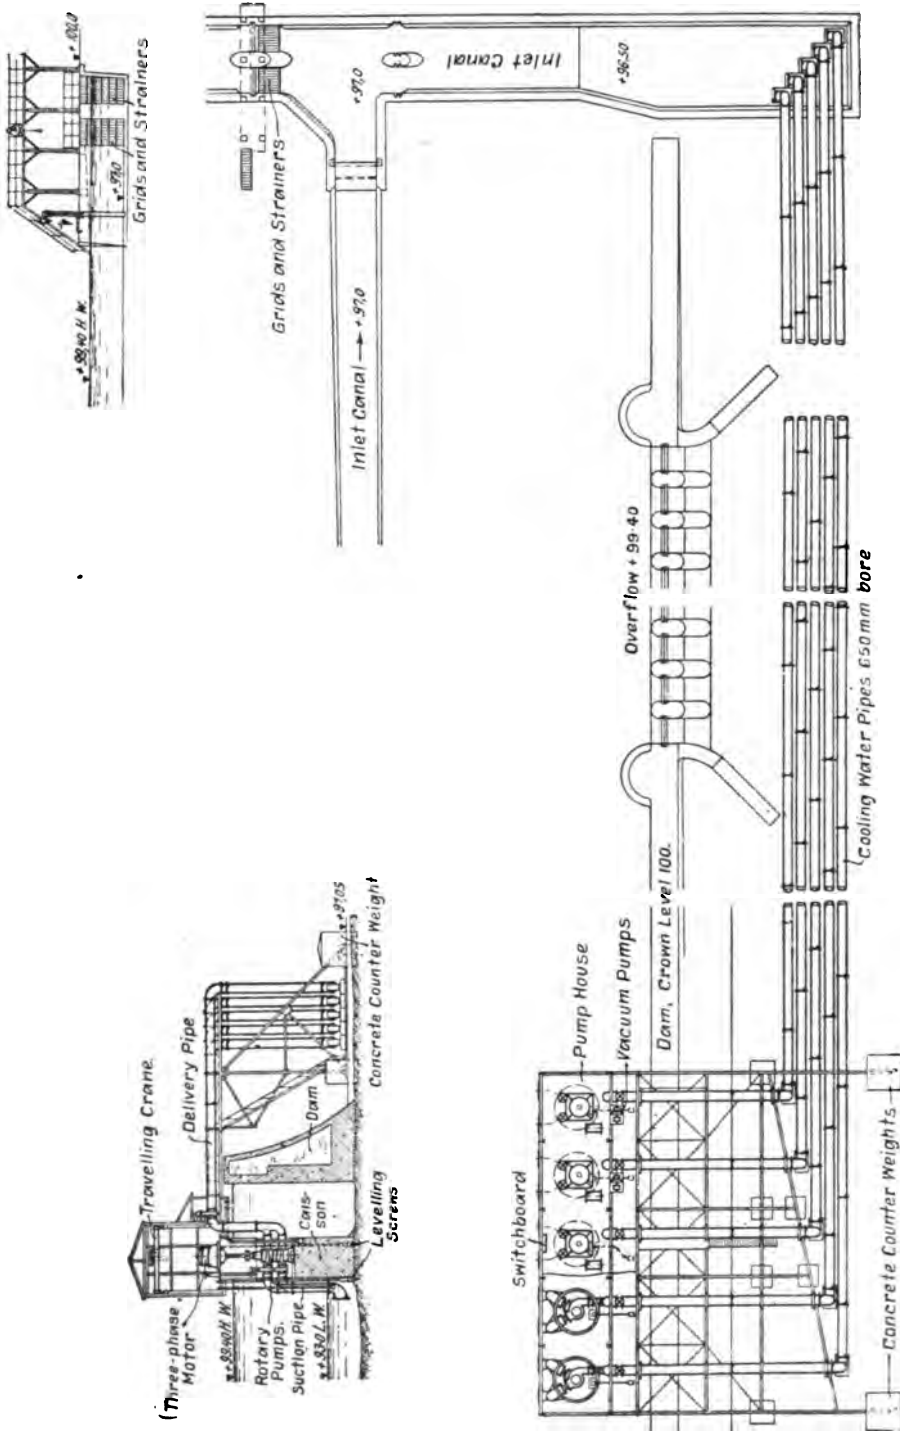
Rosherville Power Station. Plan and Section of Pumping Plant and Inlet Channel for Circulating Water. Scale, 1 to 700. (Dimensions in metres.)
